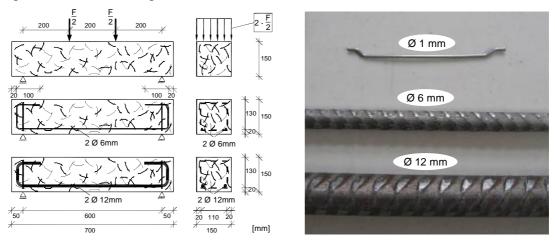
Test specimens: a) no bar reinforcement; b) 2 Ø 6 mm; c) 2 Ø 12 mm
